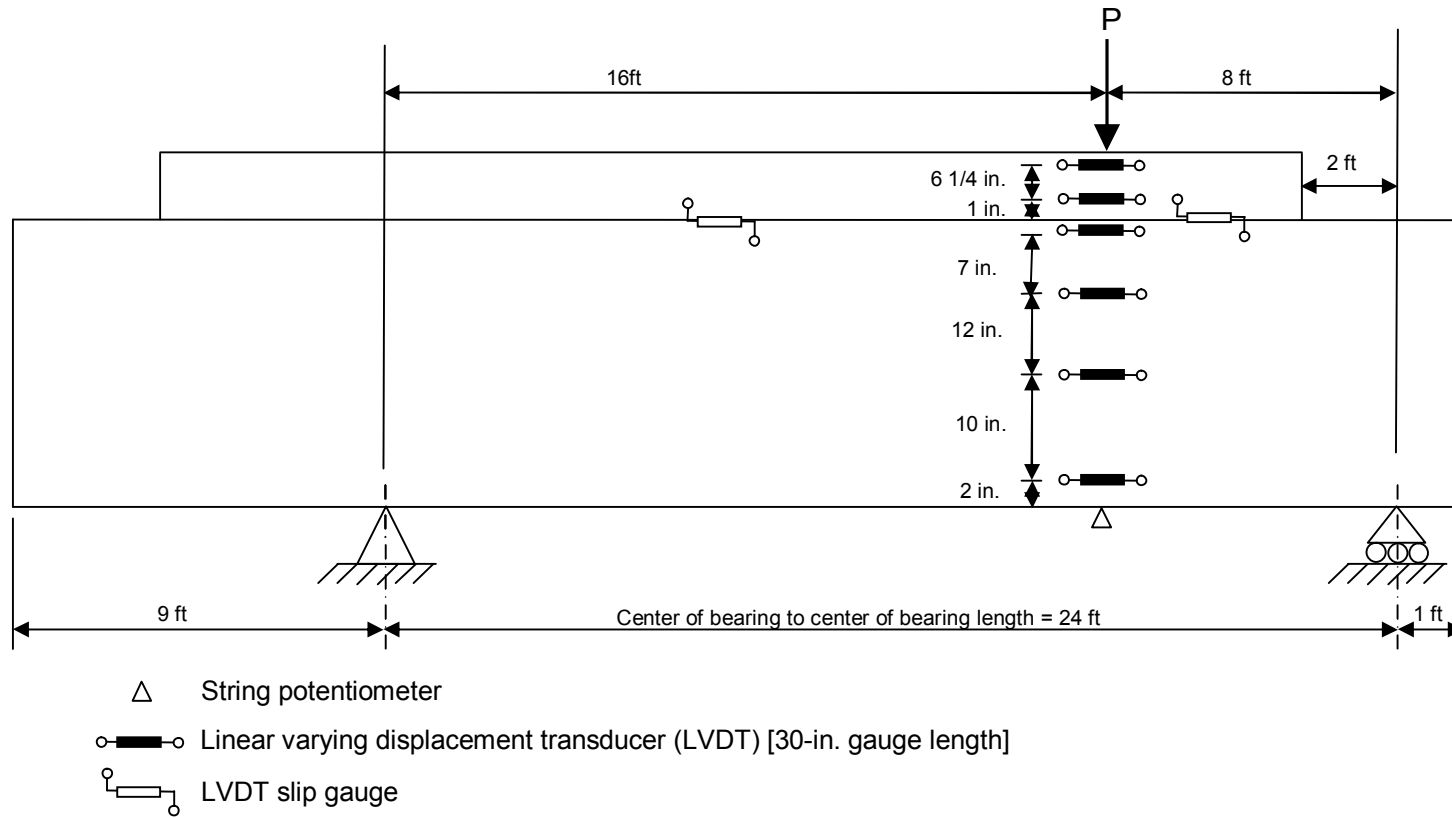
Instrumentation and setup for tests 2-1, 2-2, 3-1, and 3-2.
